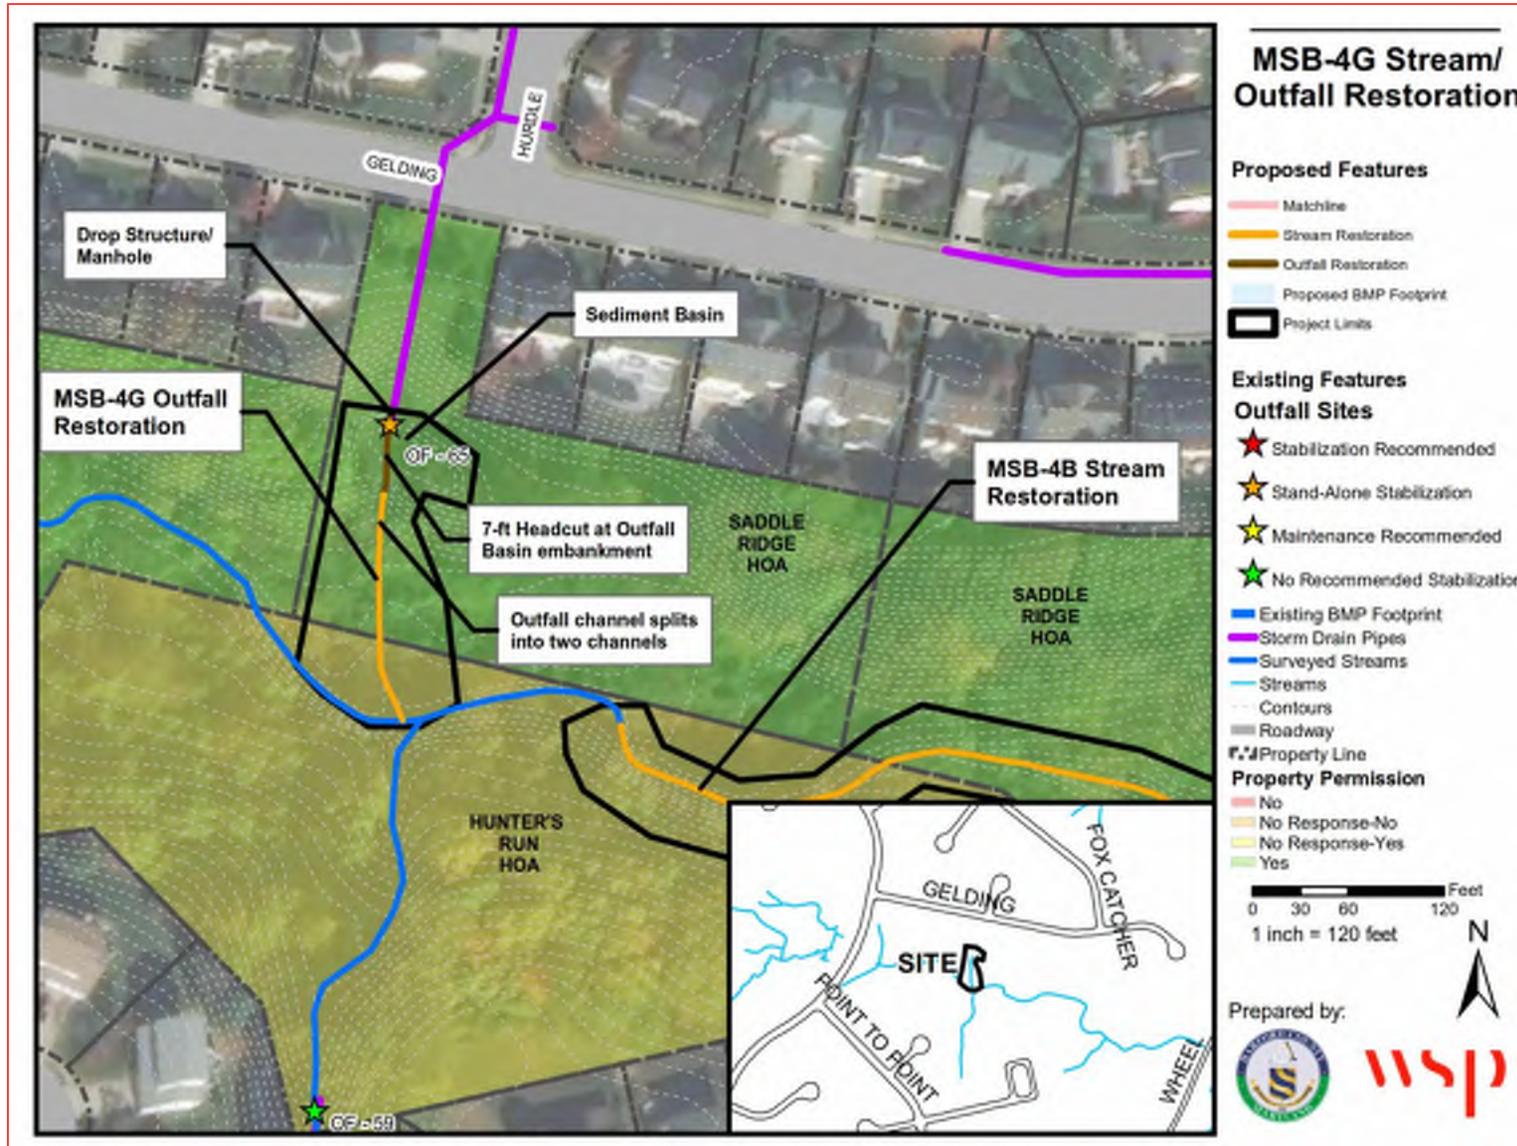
Site Location and Proposed Project Plan for MSB-4G Stream and Outfall Restoration
